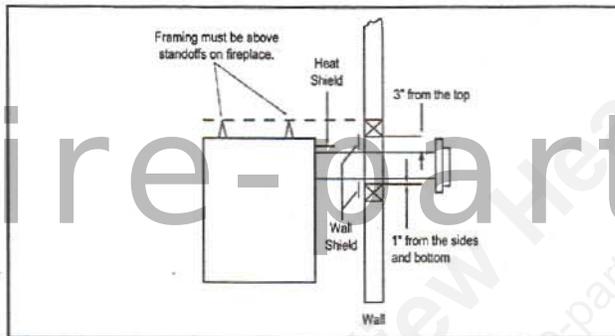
Venting Clearances to Combustible Materials Rear Vent
